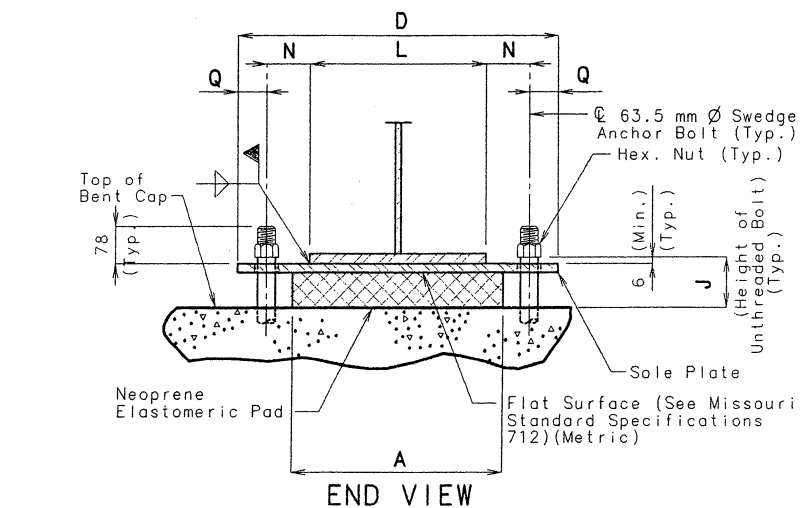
DETAIL OF ANCHOR PLATE FOR EXTERIOR GIRDER
